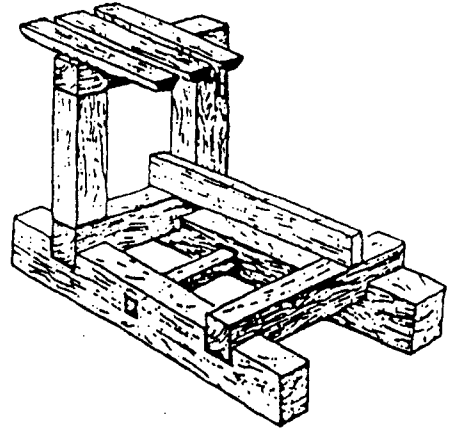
HEAVY WOOD FRAMES OF THE WINDOWS OF THE EXCAVATED BUILDINGS IN SANTORINI (AKROTIRI 1500 B.C.)
